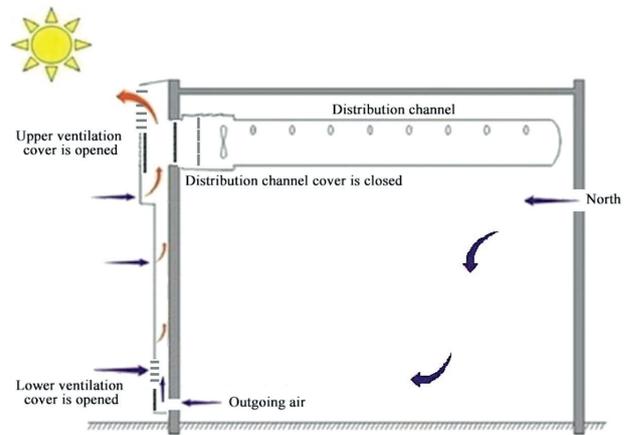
Working principle of metal walls in summer (Solar Wall, 2016)
